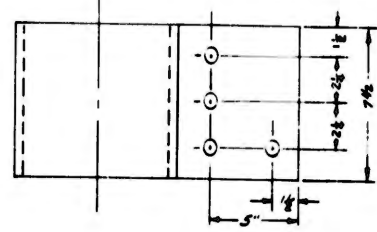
PLAN VIEW FORESTPORT TOWER MODIFICATION (CONFIGURATION NO. 4)
